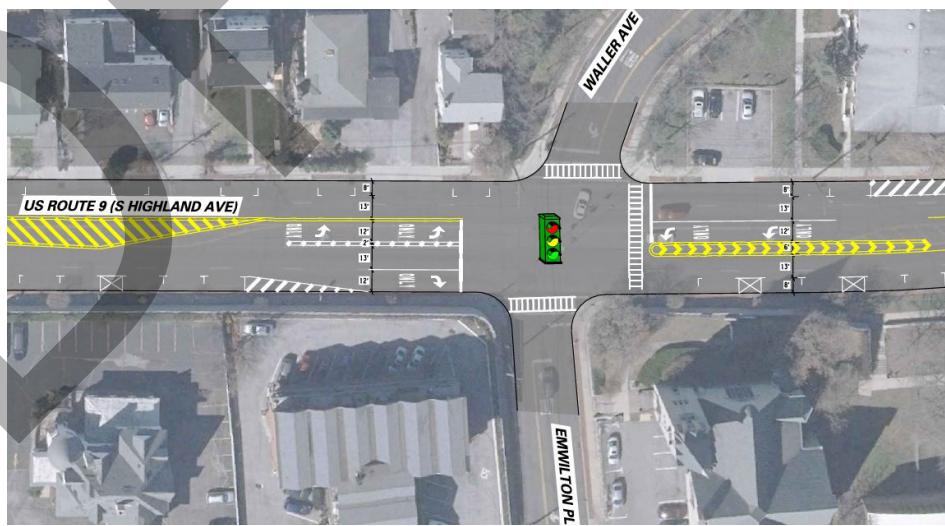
Road Diet Concept at Intersection of US Route 9/Waller Ave./Emwilton Pl.
